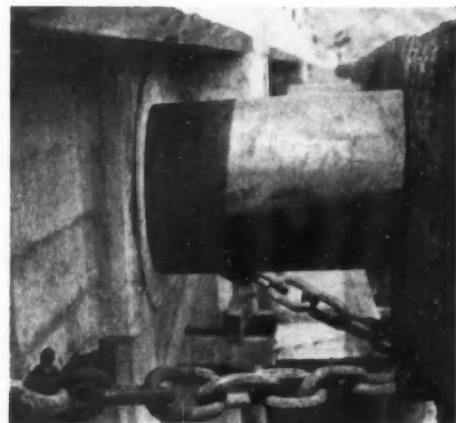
Close-up of rubber buffer at Port Taranaki.
